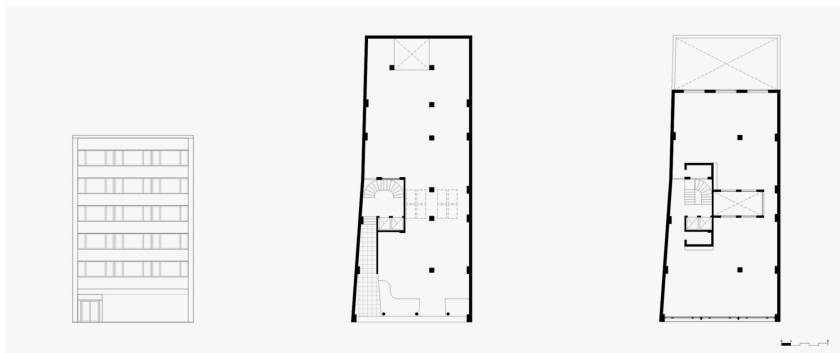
Viamonte 769, Buenos Aires (redrawn from original plans by the author)
